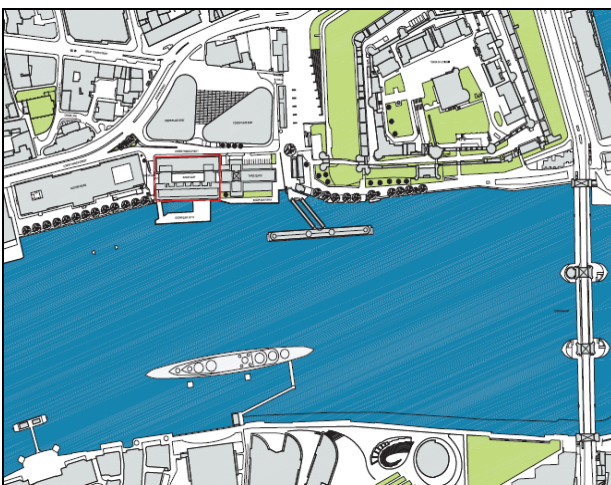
& 2: Site location plan and view of site from The Queen's Walk (Source: D&A Statement)
